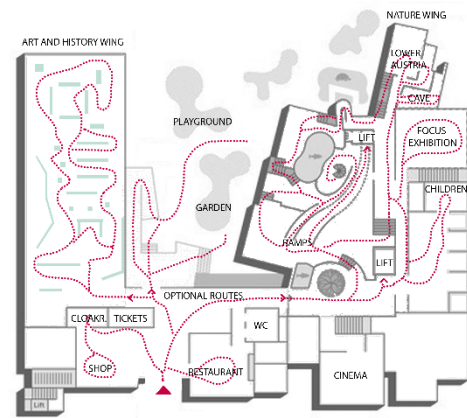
Lower Austria Museum in St. Pölten: Ground floor. (Source: Floor plan by Niederösterreich Museum Betriebs GmbH with Markings by Filová, 2021)
